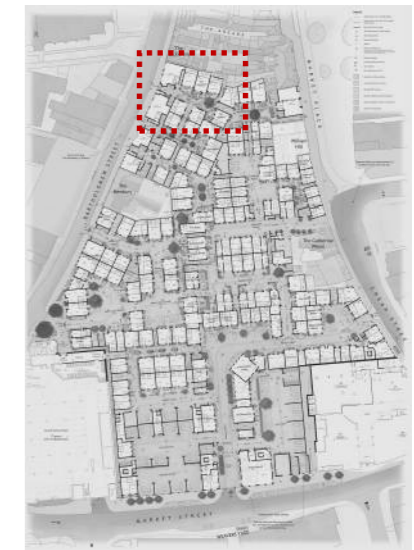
Ground Floor Layout of Artist's Mews (North).
